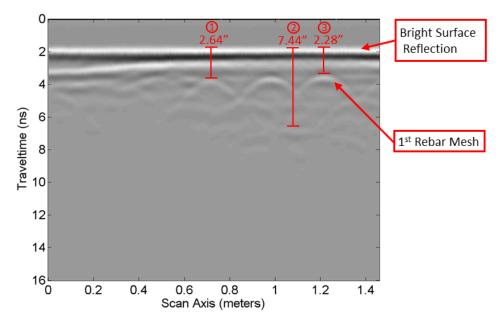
GPR Image (File 143), corresponds to a GPR scan on Area 3 on Bridge 76. Perpendicular to steel bridge deck girders.
